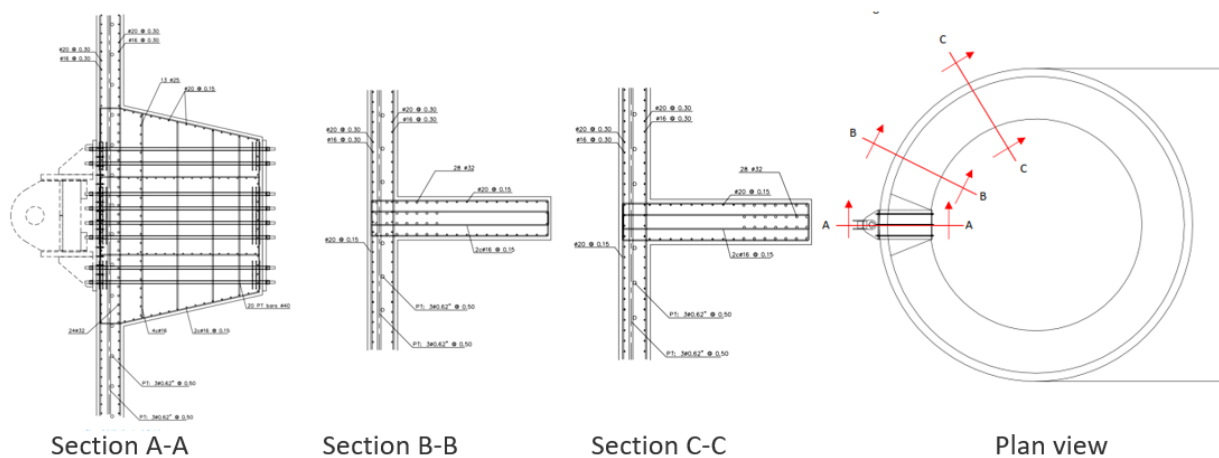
Activefloat local strengthening in the fairlead plate anchoring system
